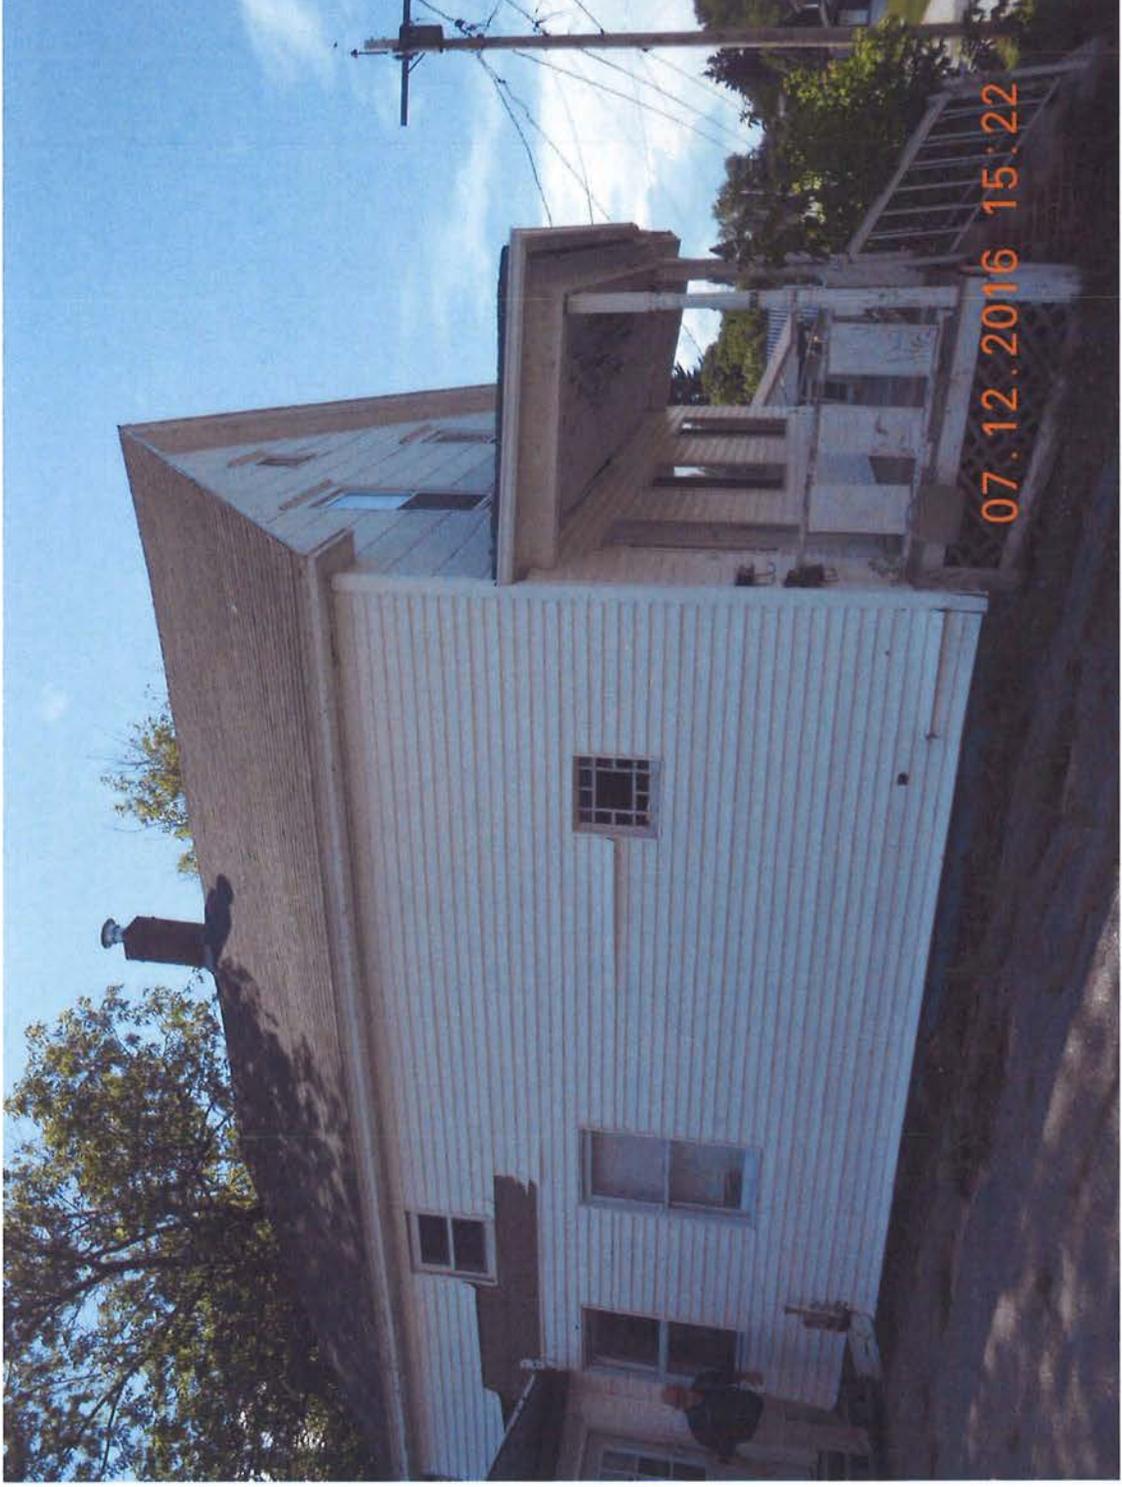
shows the collapsed deck and porch roof bearing post off of the bearing metal pipe creating a dangerous potential for catastrophic collapse.
